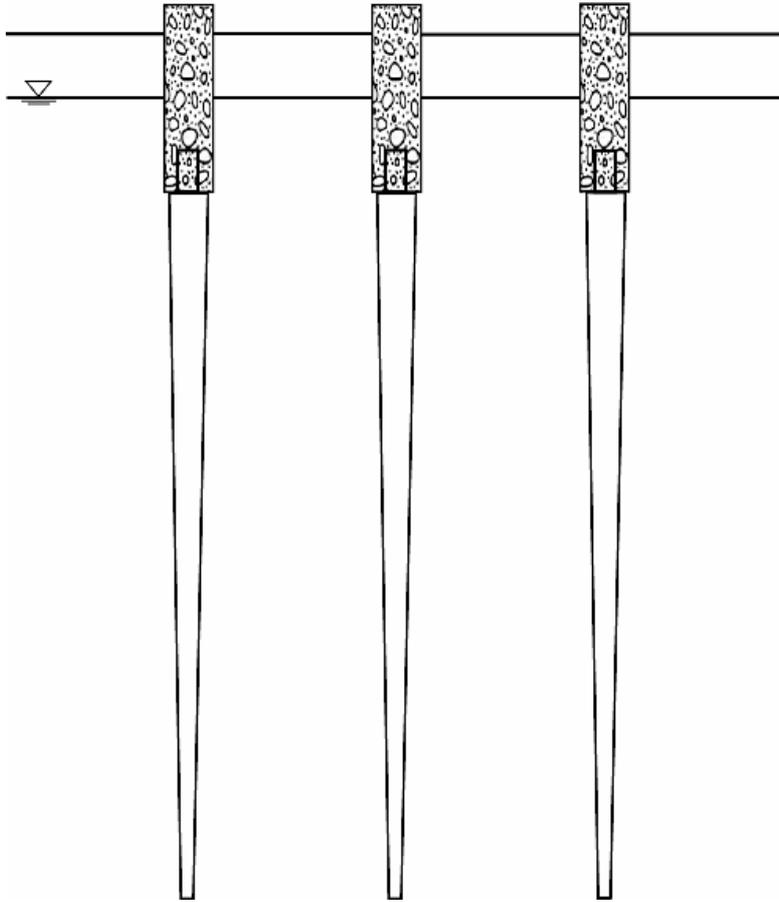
Tapered friction piles, extended above the water table using concrete sections
